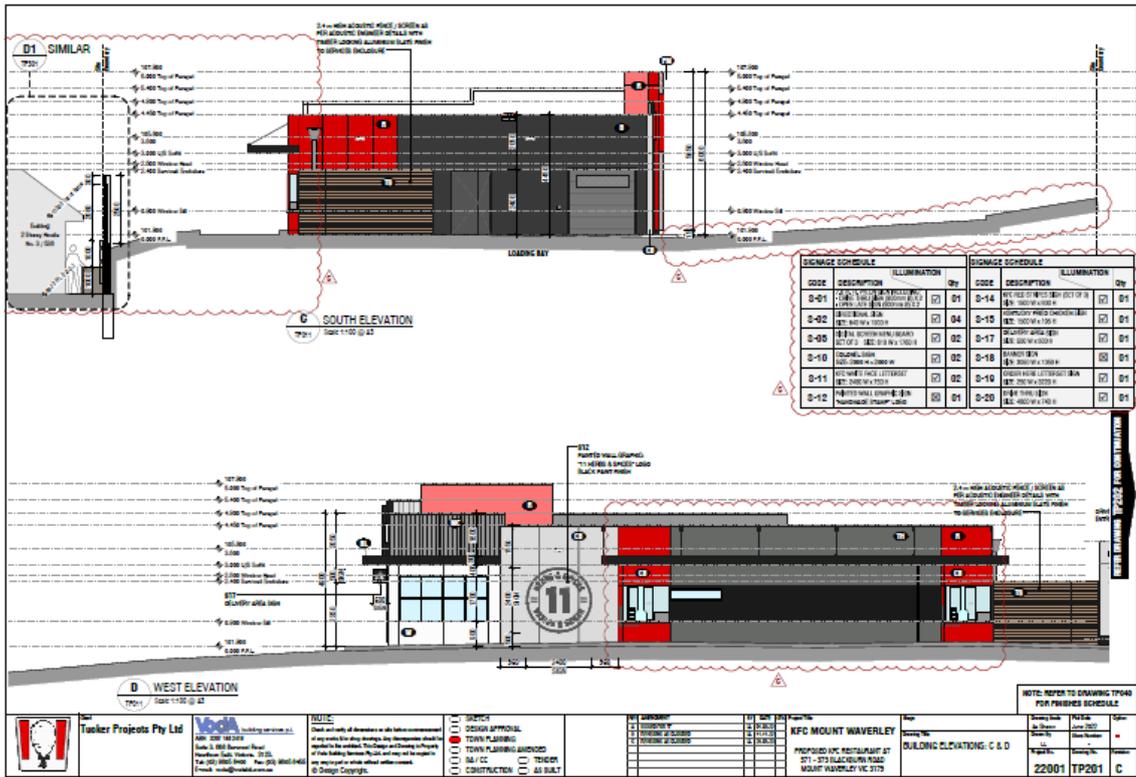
Perspectives, Site Layout and Elevation Plans – Source: Substituted Plans
